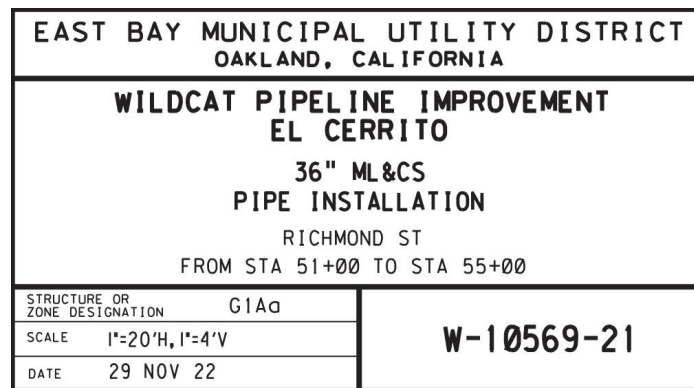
W-Drawing Title Block (Large Diameter)
